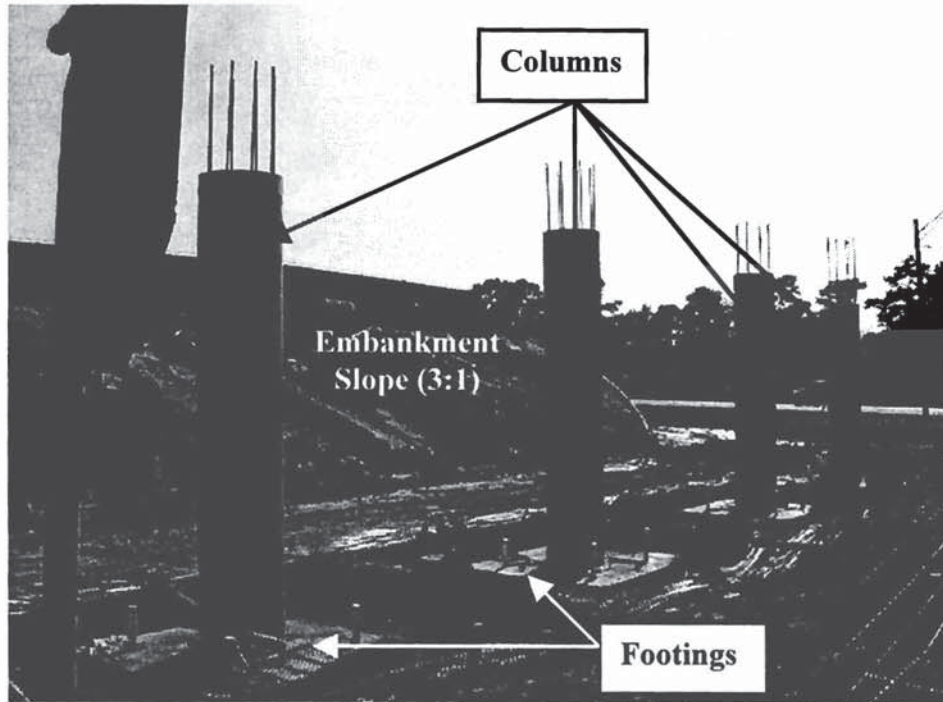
Completed Concrete Columns at Krenek Road Bridge Site
